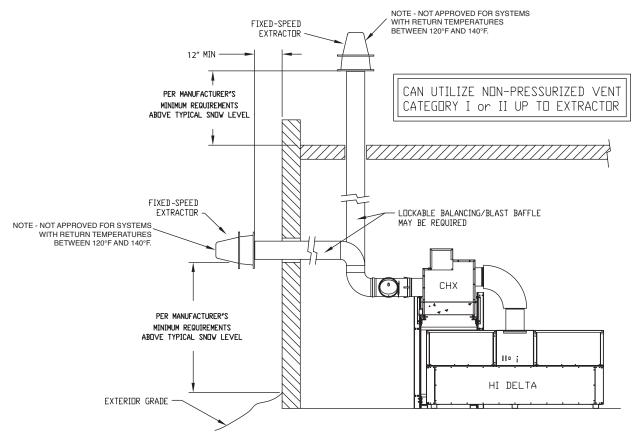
Top-Mounted CHX with Fixed-Speed Extractor
